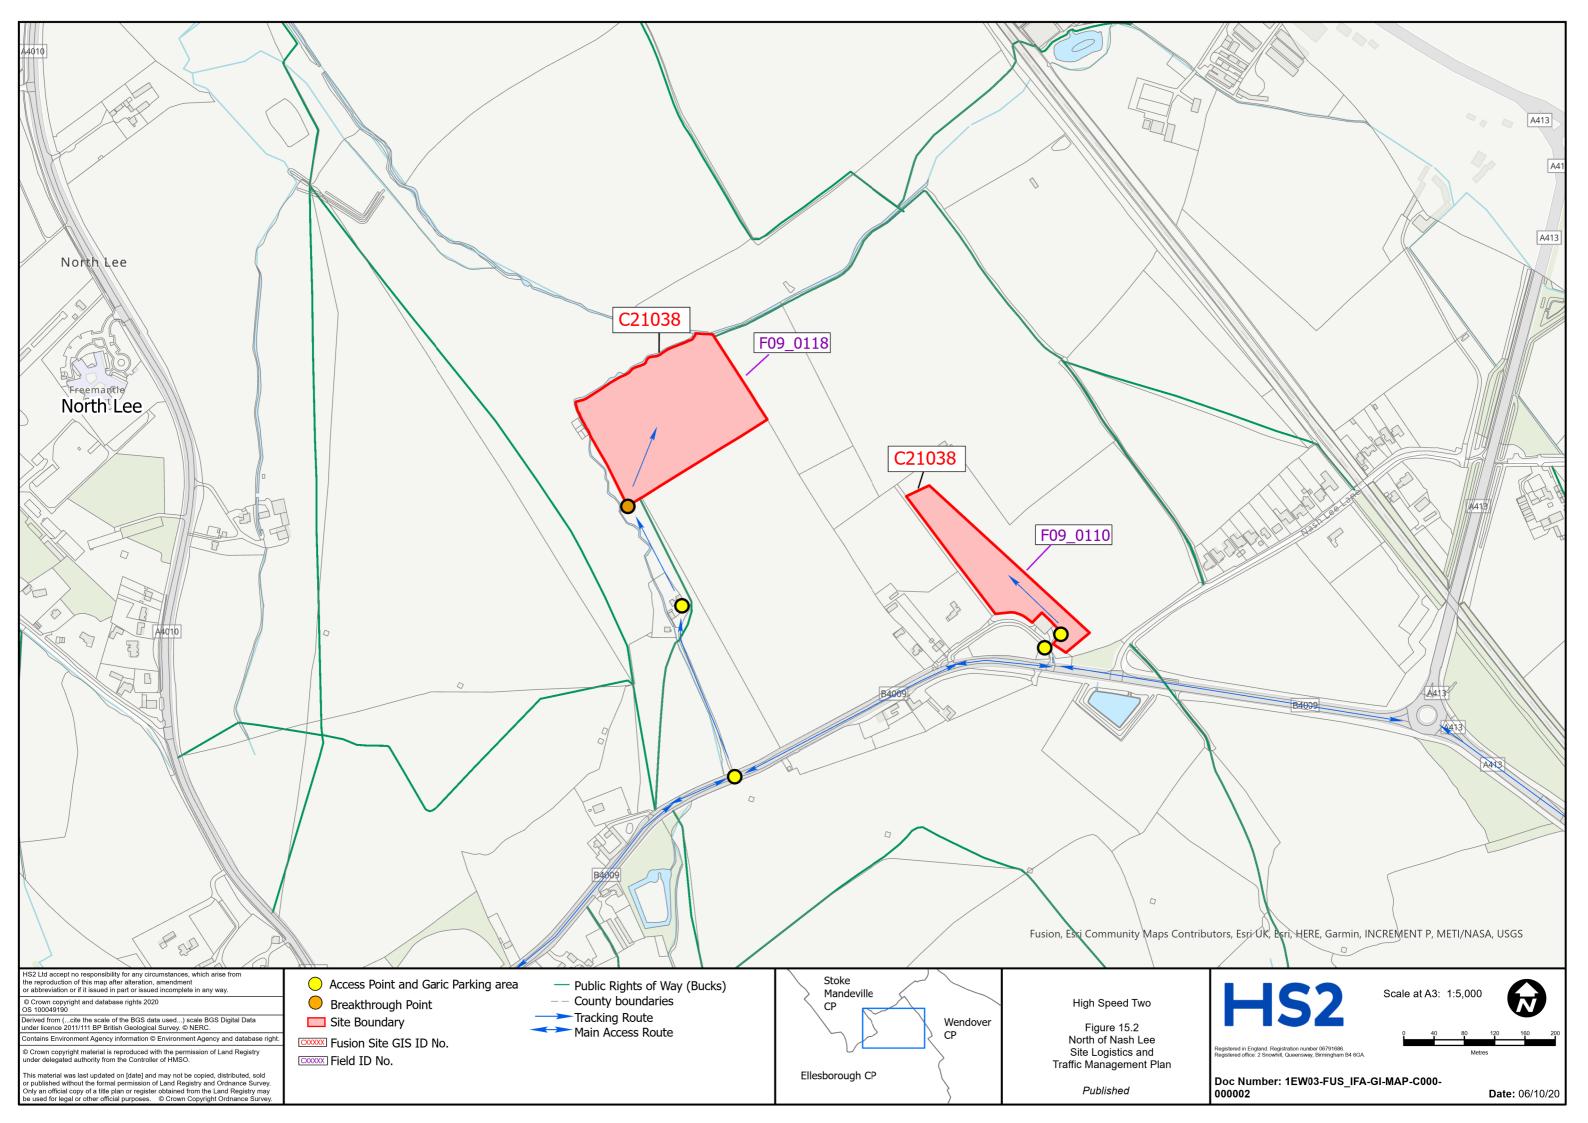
Site Logistics and Traffic Management Plan (one per site, numbered 2.1 to 2.14)
